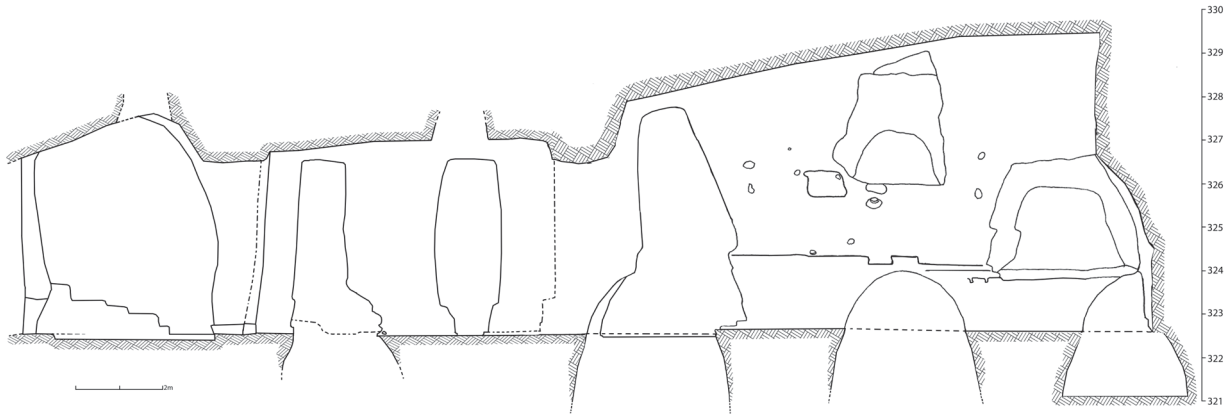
Cross-section 2:2 Rooms 11, 10, 7.
